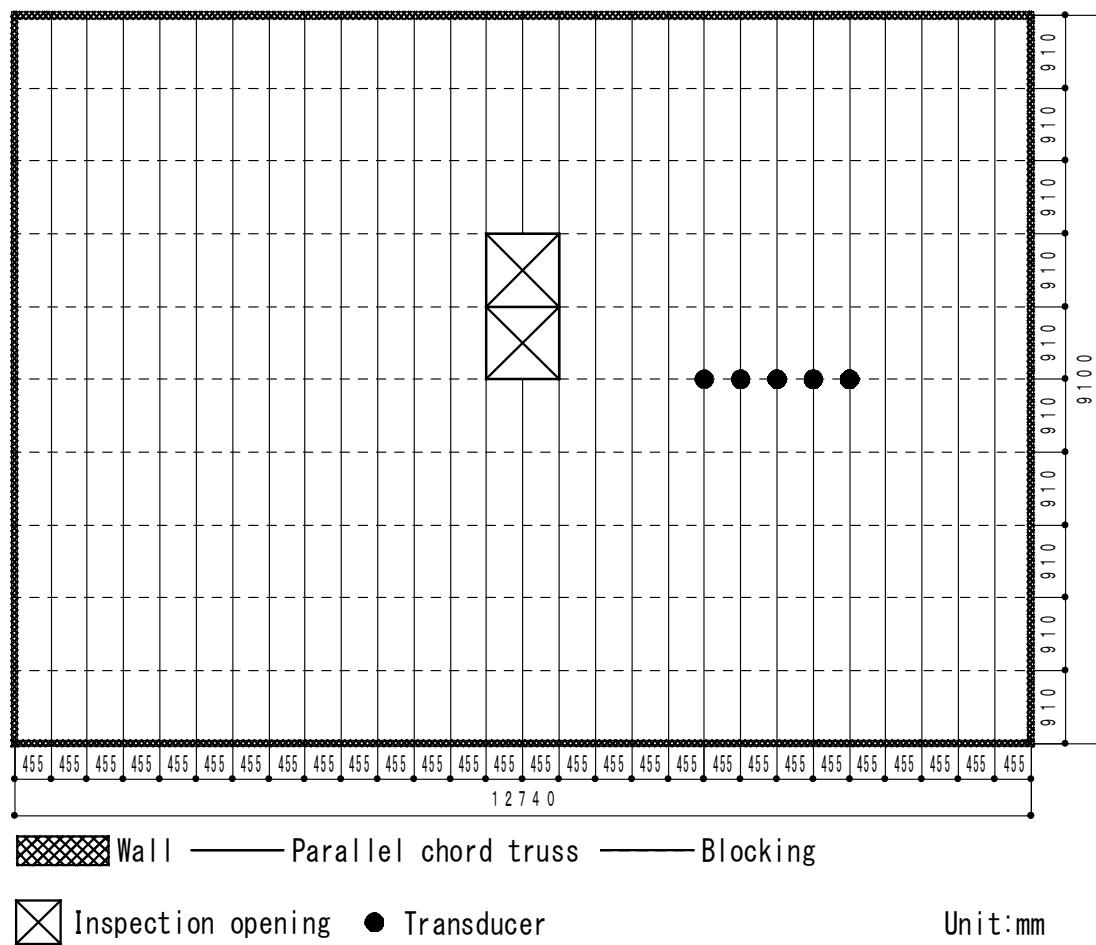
Upstairs floor framing plan of a measured room in office E.
